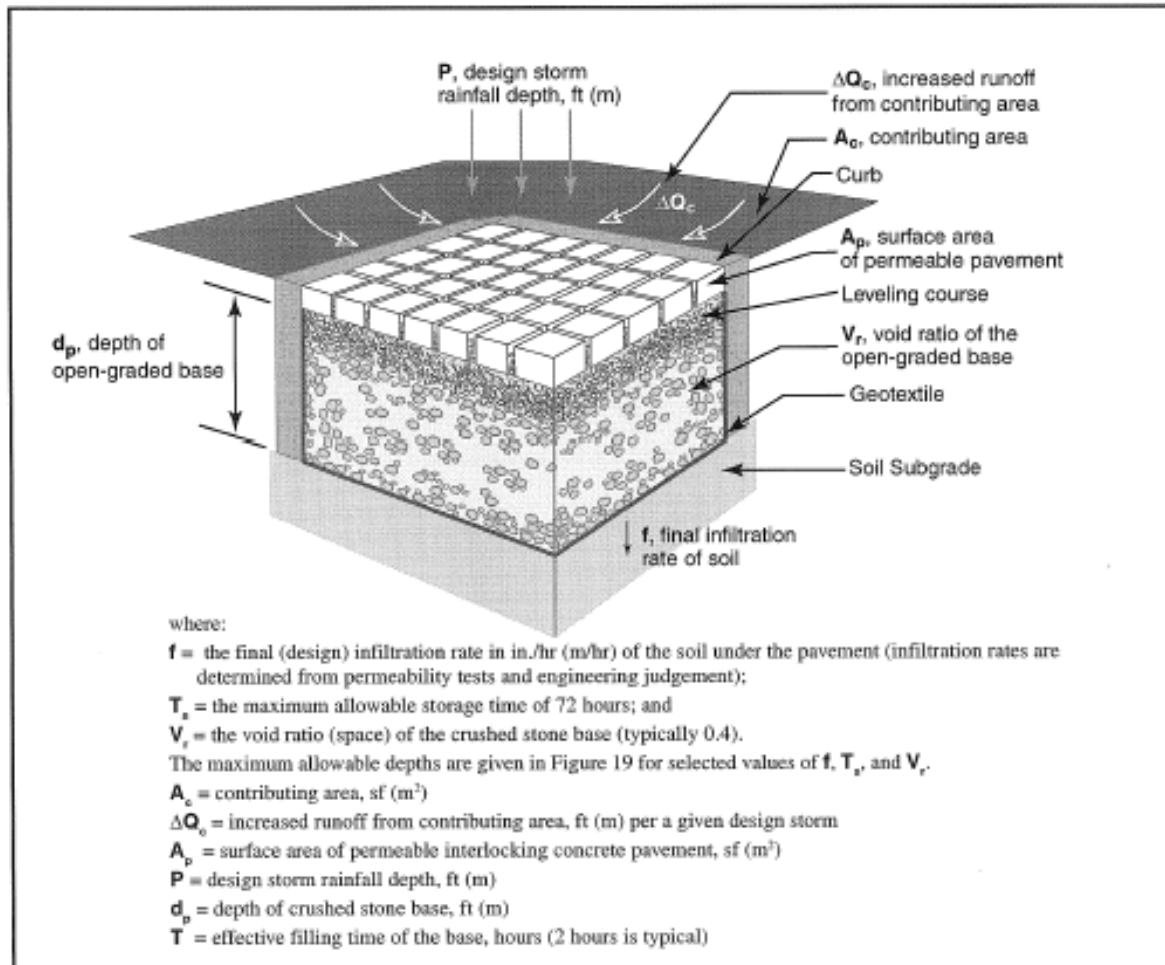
Design parameters for calculating the base depth for permeable interlocking concrete pavements.
